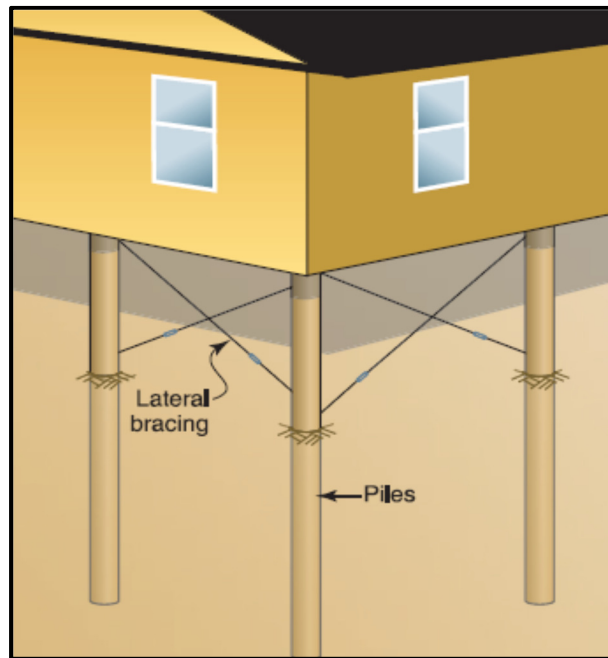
Pile Foundation (source: FEMA Homeowner's Guide to Retrofitting)
